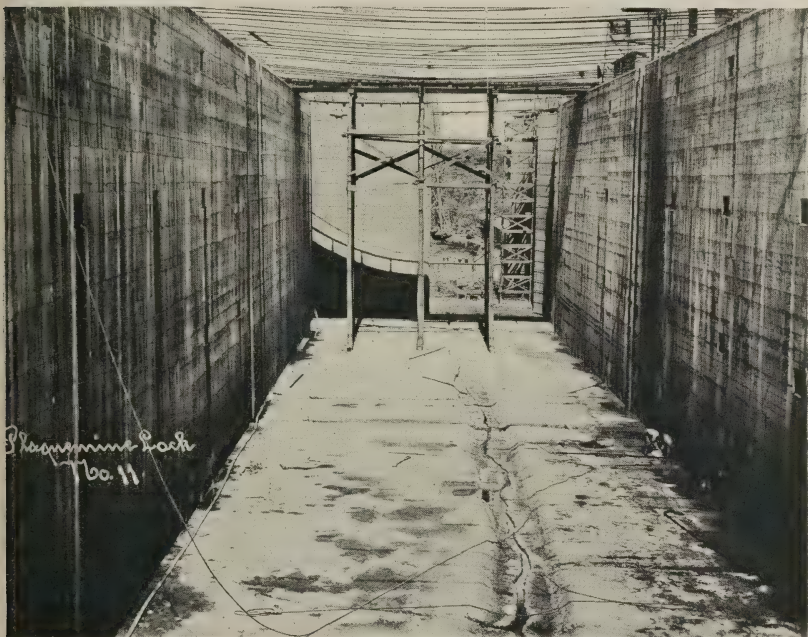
Showing crack in floor due to unequal settlements, and 2-inch rods across top of lock to draw walls together.
